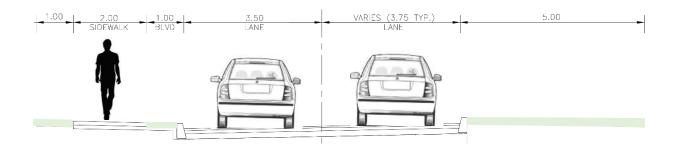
Typical Cross-Section of Chamberlain Avenue
